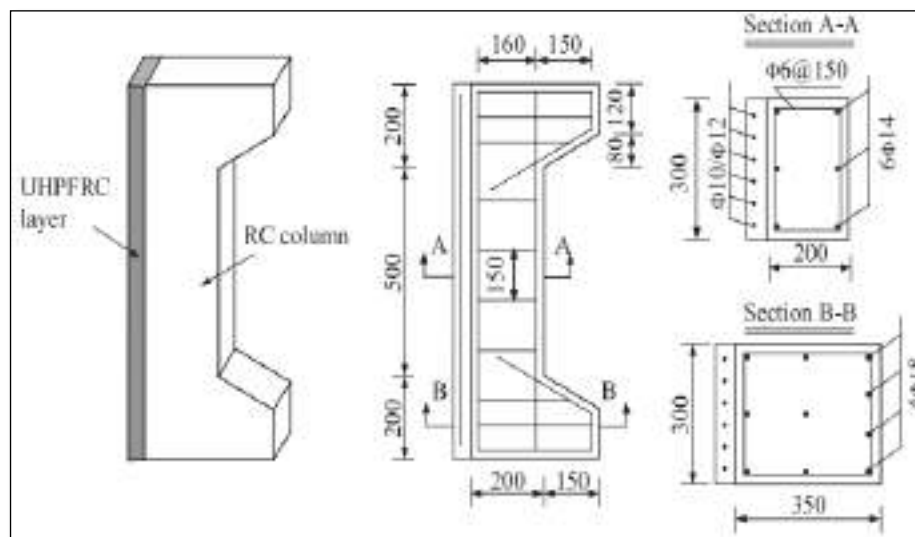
Geometry and Rebar Arrangement (unit: mm).[44]
